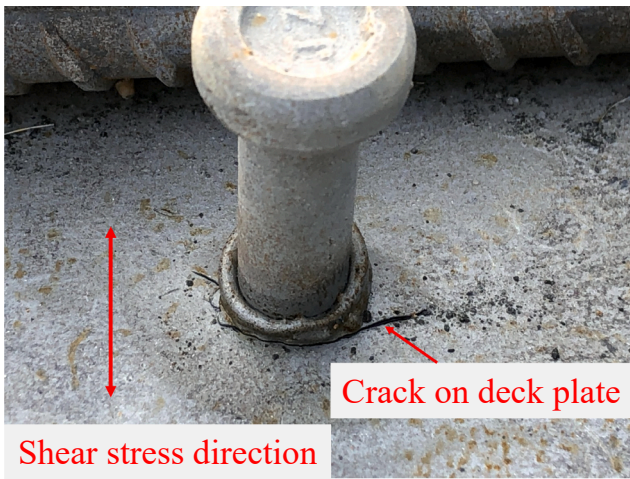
Crack of steel deck plate around weld collar.
